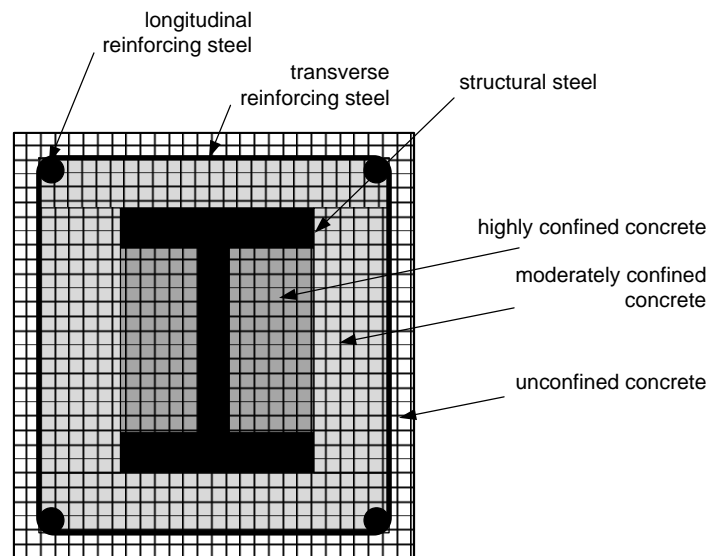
Fibre discretization of a steel-reinforced concrete composite section
